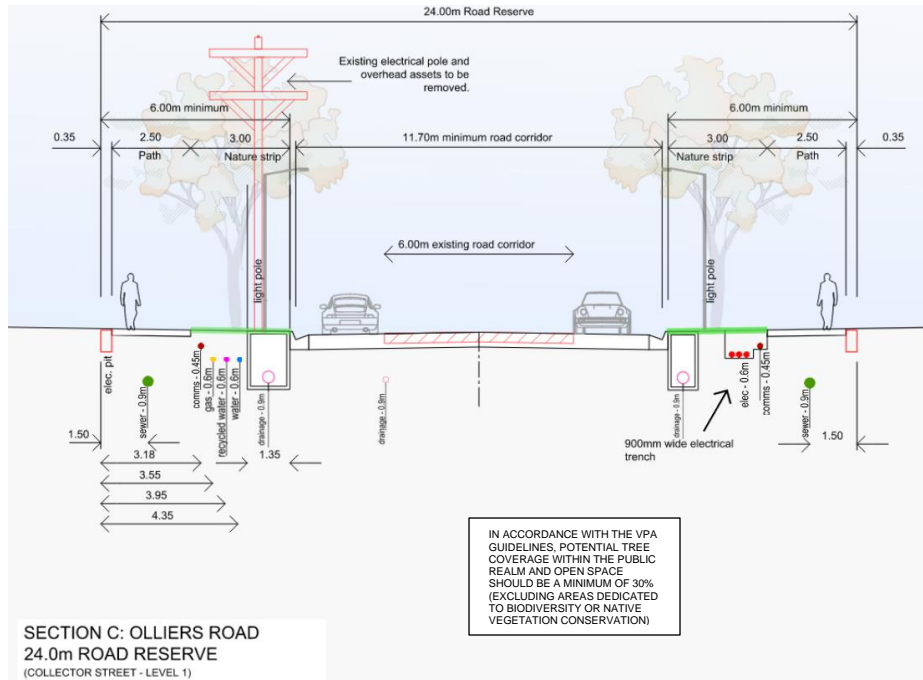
Typical Cross Section - Collector Street Level 1 (Olliers Road)
